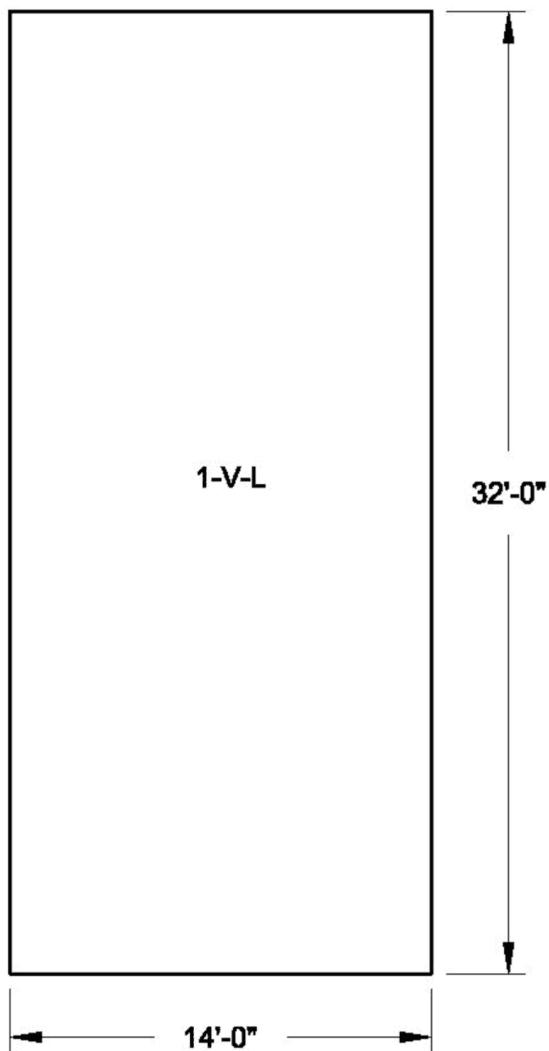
H.6-154A DGFO SV Slab 3 Looking Down
